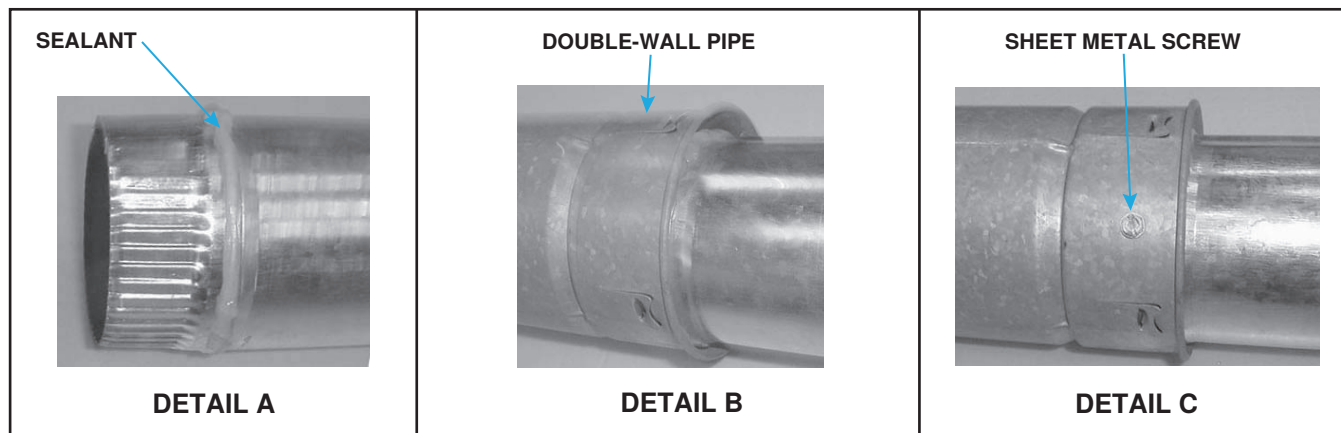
Connecting Double-Wall (Type B) Pipe to Single-Wall or Category III Vent Pipe
